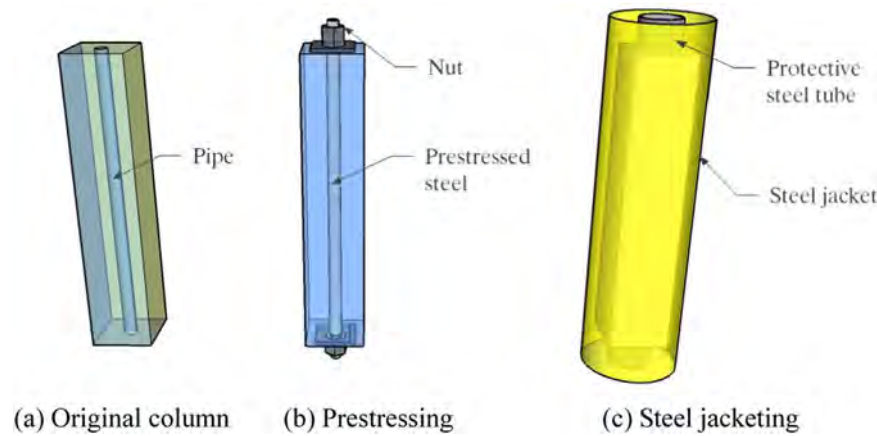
Execution of specimens with preloading. (a) Original column (b) Prestressing (c) Steel jacketing.
